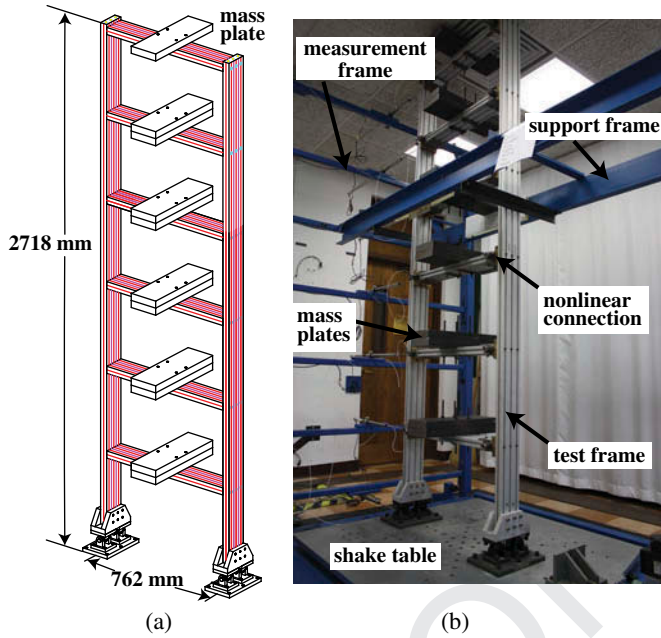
Six-story frame: (a) schematic (beam-column connections not shown); (b) test setup.
